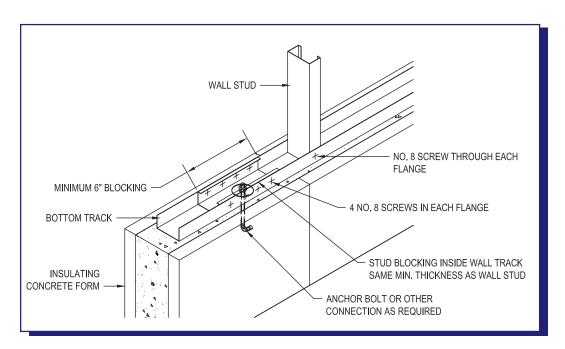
Direct Track to ICF Wall Connection Refer to Table 6.2, 6.3, and 6.4 for Required Installation Schedules
